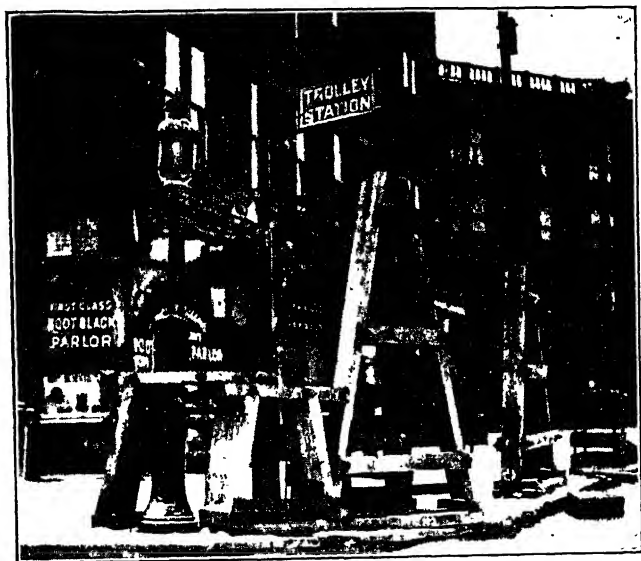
OBSTRUCTING STREET CORNER BY POSTS
